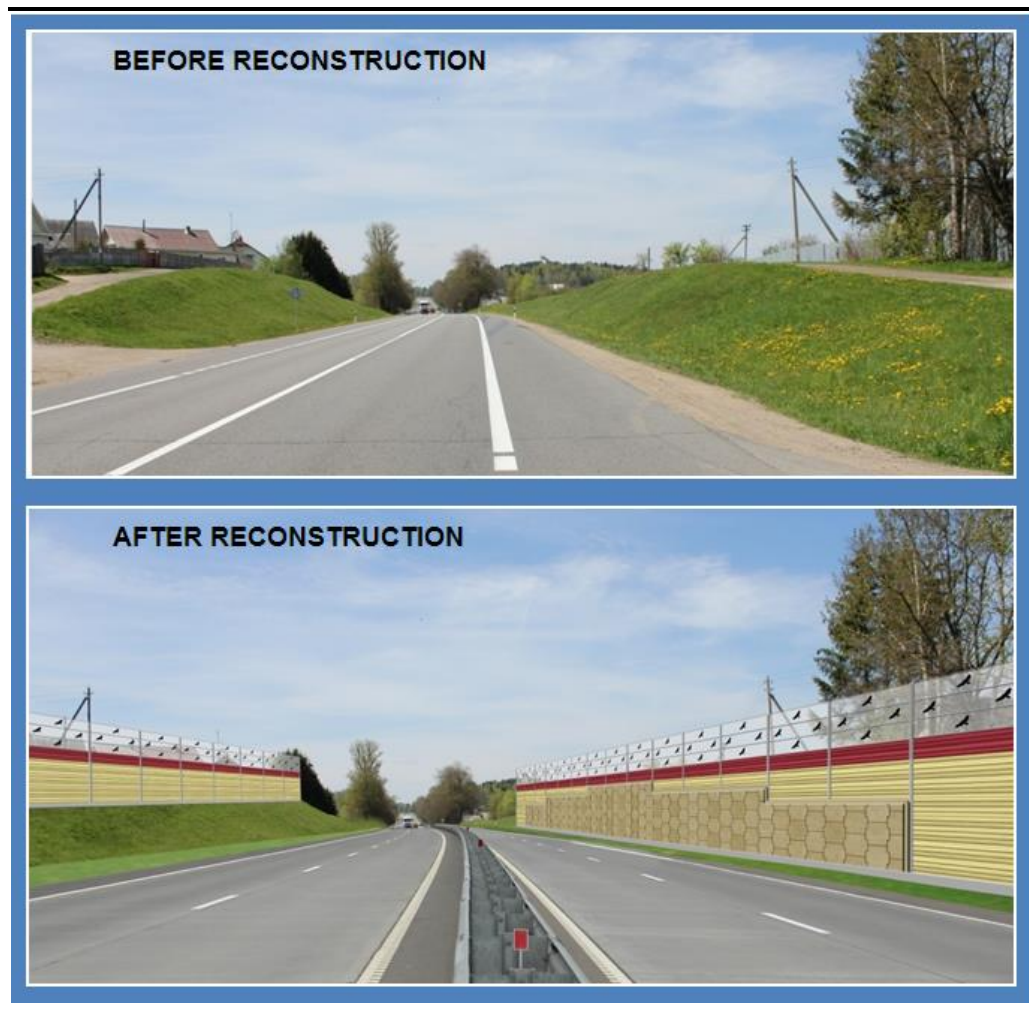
View of the road section before and after the reconstruction and installation of noise shields
